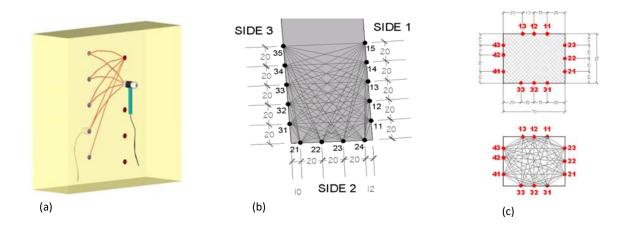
Sonic pulse tomographic arrays. a) Vertical section application. b) Arrangement of receivers on the faces of a wall. c) Horizontal section and pulse paths inside from 4 accessible faces. (ONSITEFORMASONRY, 2004)
